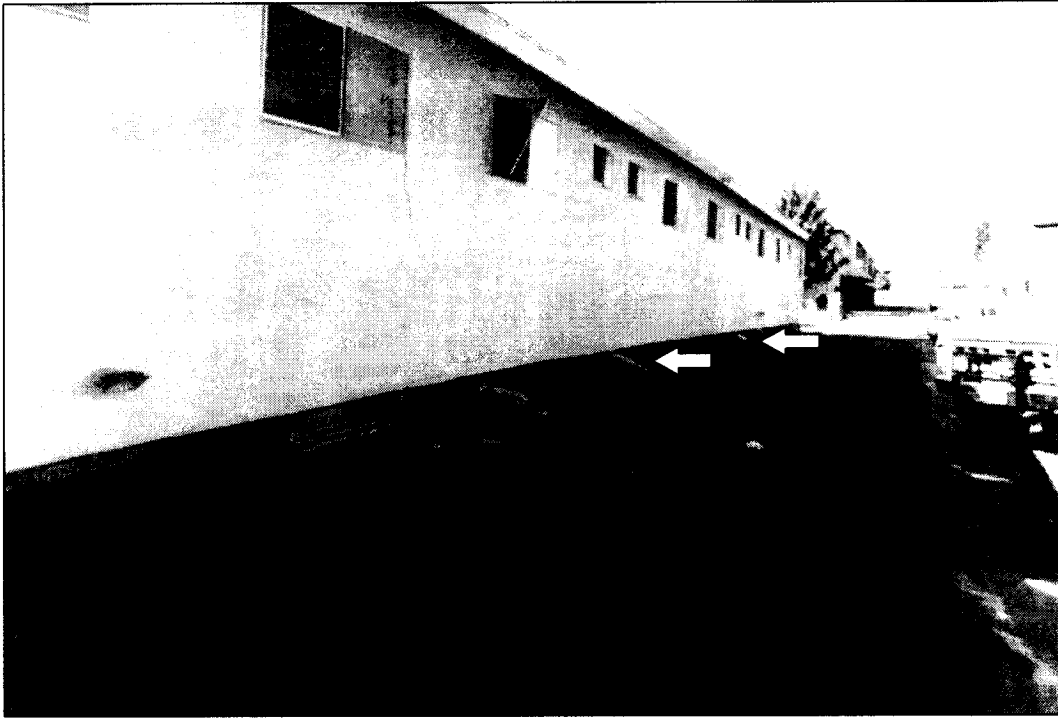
Damage to a tuck-under parking building with stucco shearwalls
